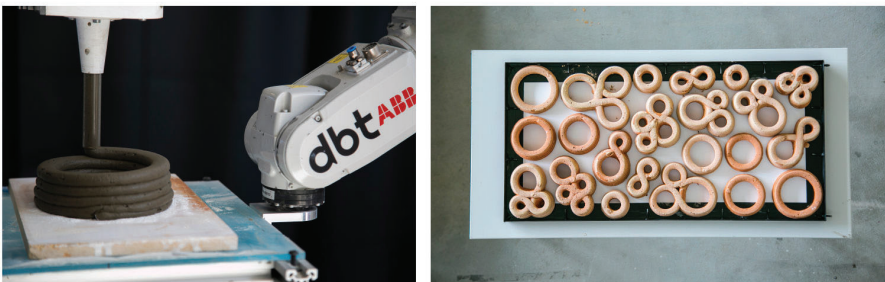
Fabrication of the final demonstrator. Left: 3DP of one module. Right: assembly of sintered modules in steel frame before casting of UHPC.
